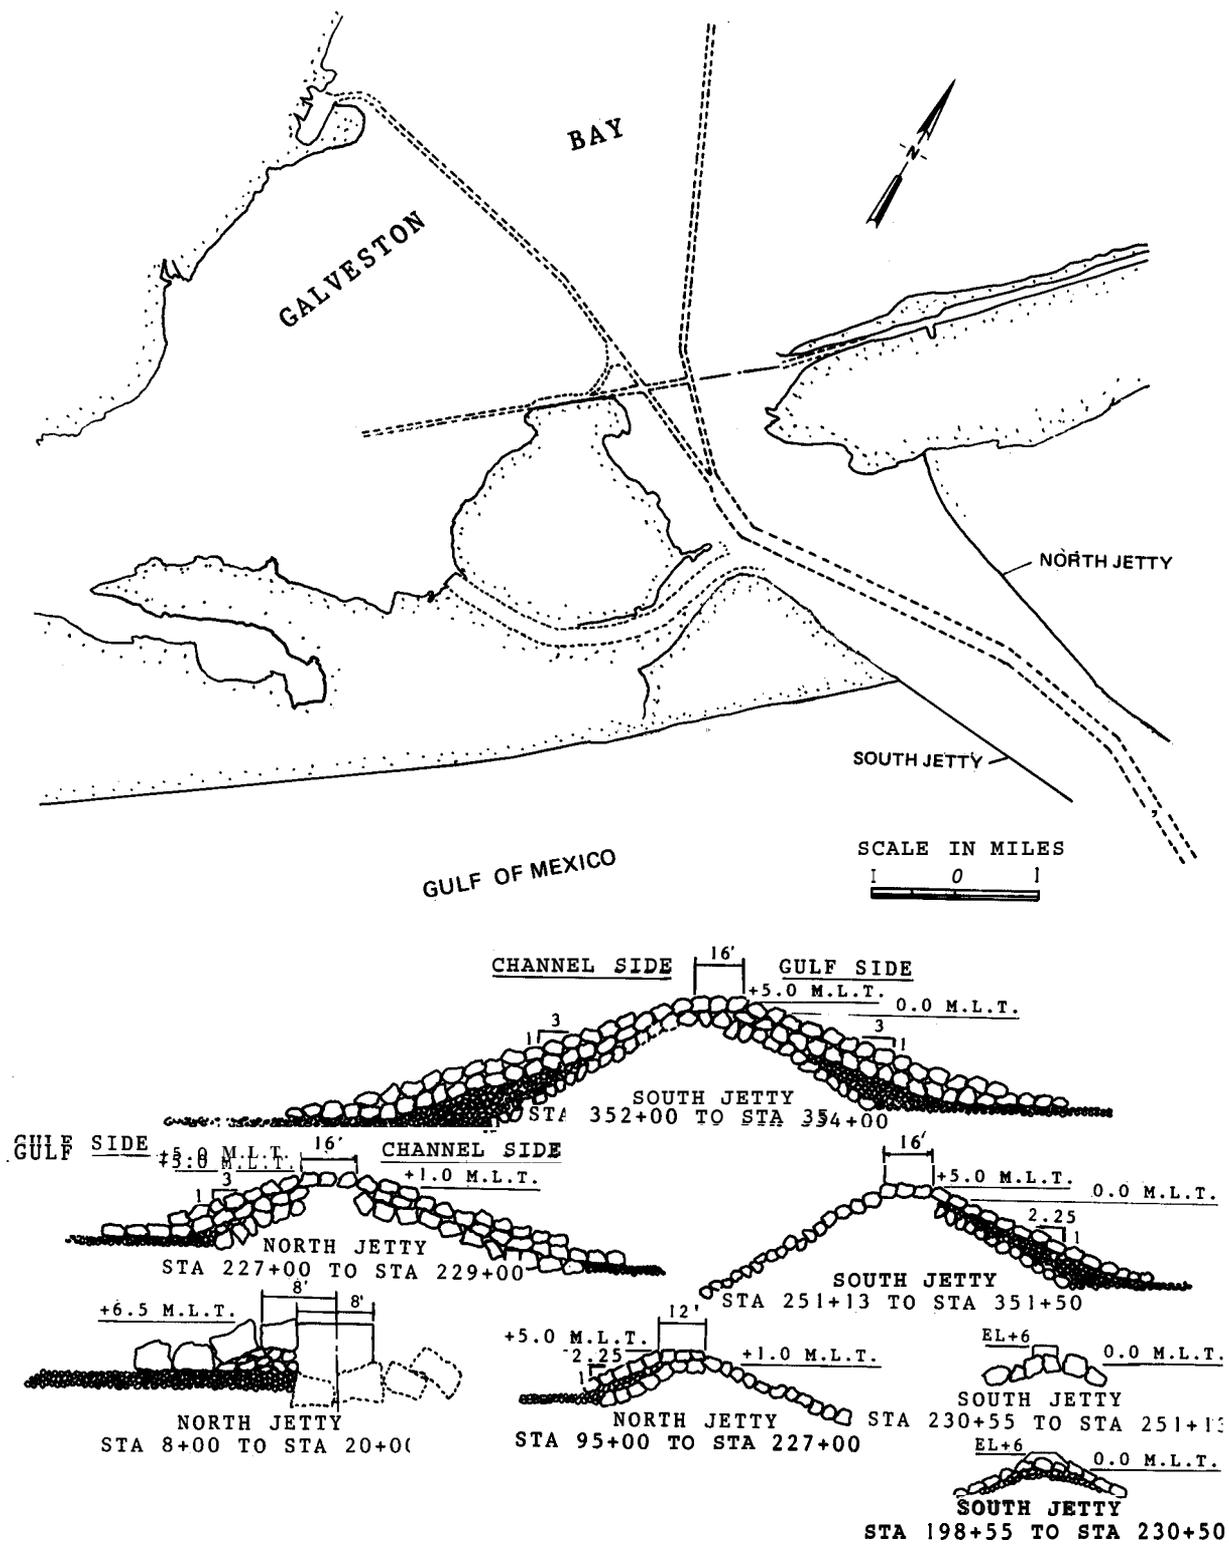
Plan view and typical cross sections of Galveston Harbor jetties
